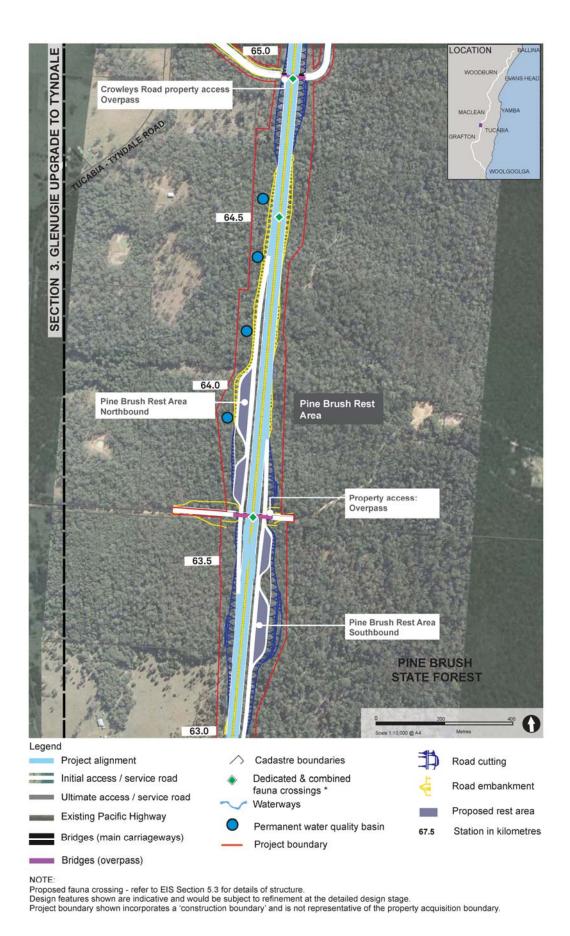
The project - Section 3 (Station 63.0 to 65.0)
